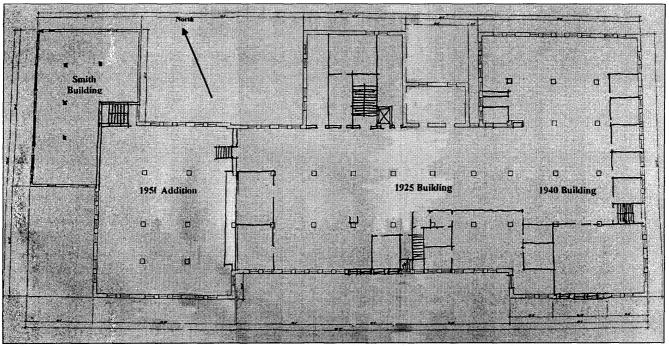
Second floor floor plan (M+ Architects, Sioux City)
